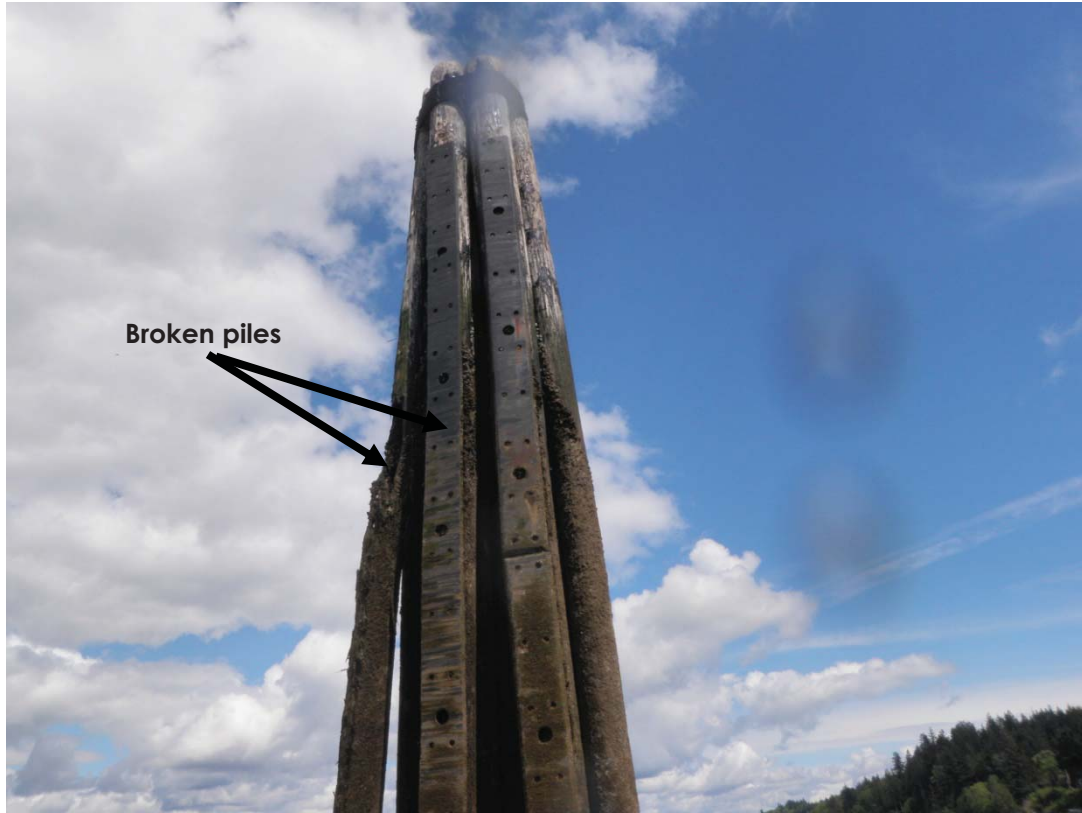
North-West timber dolphin at the Mainland Ferry Terminal
